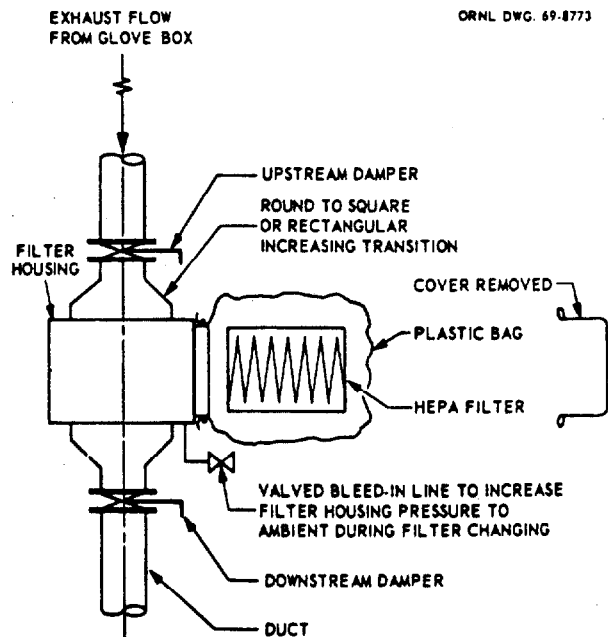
Typical connection for a single-filter housing in a glove box exhaust stream.
